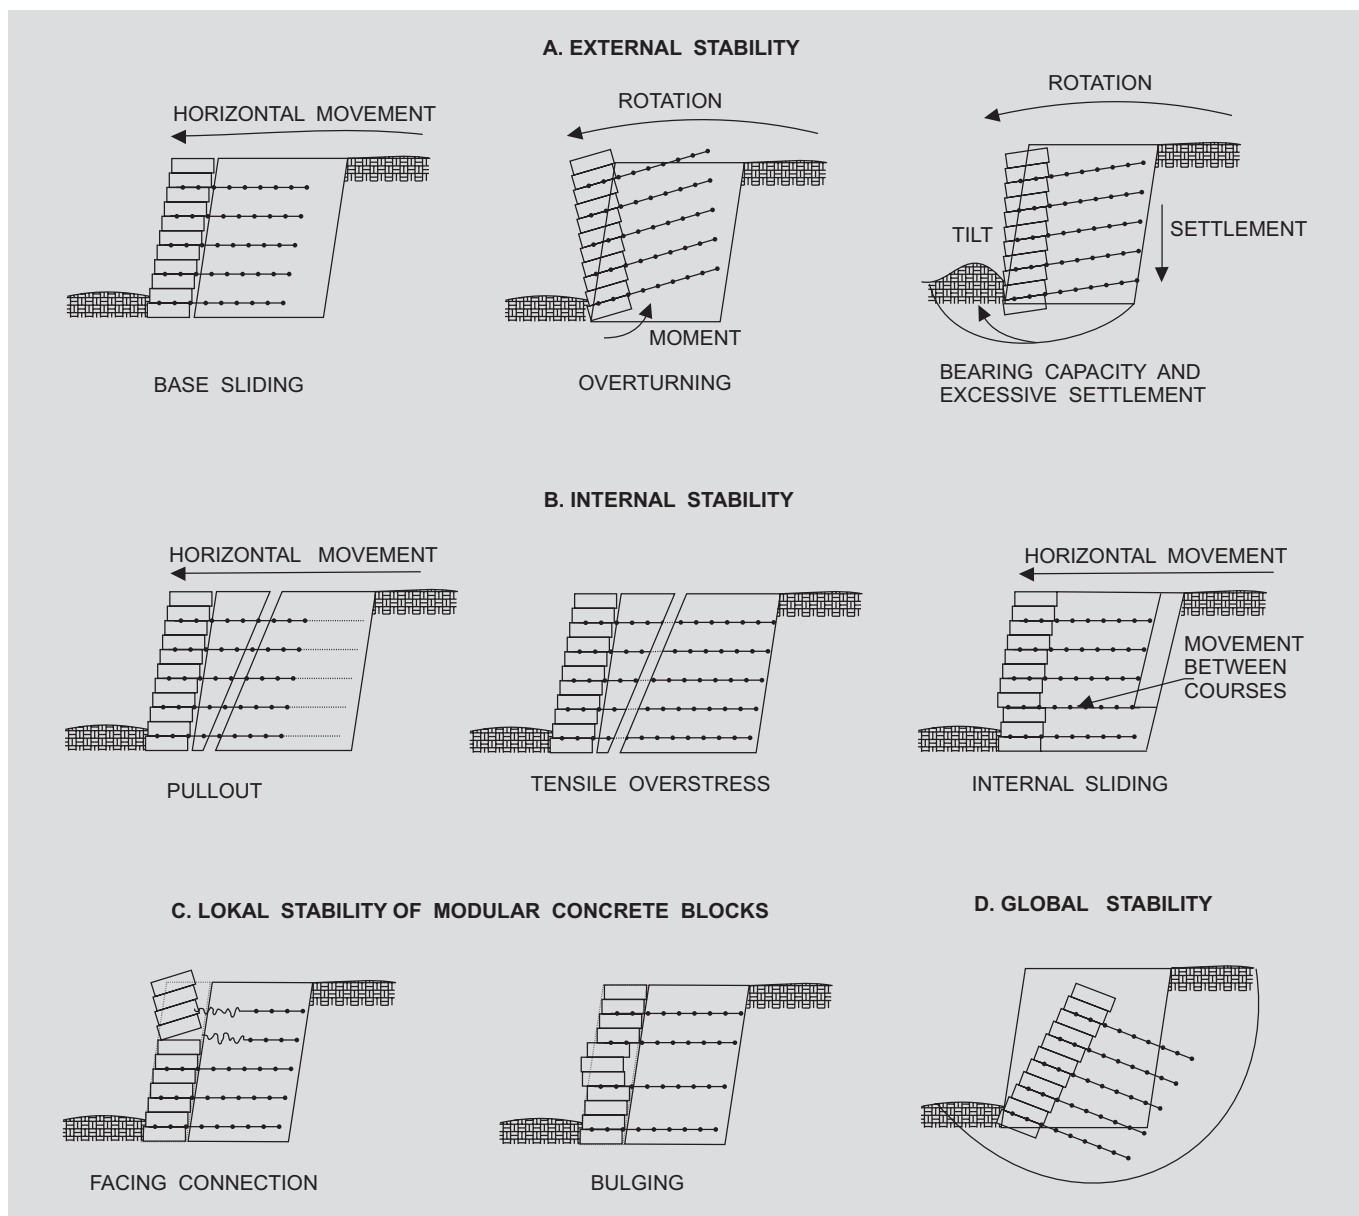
Basic modes of failure of reinforced soil segmental retaining walls
